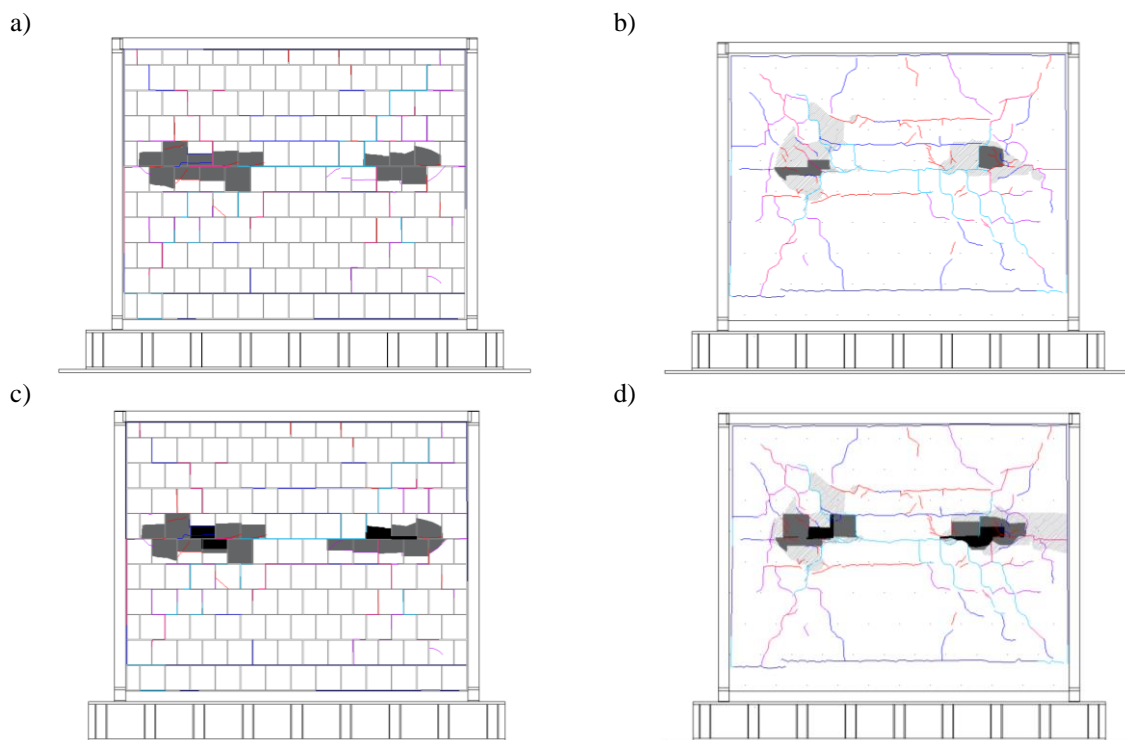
Damage state attained in specimen T3 after in-plane drift of 0.65% (a) bare face (b) plaster face and before collapse as seen on (c) bare face (d) plaster face
